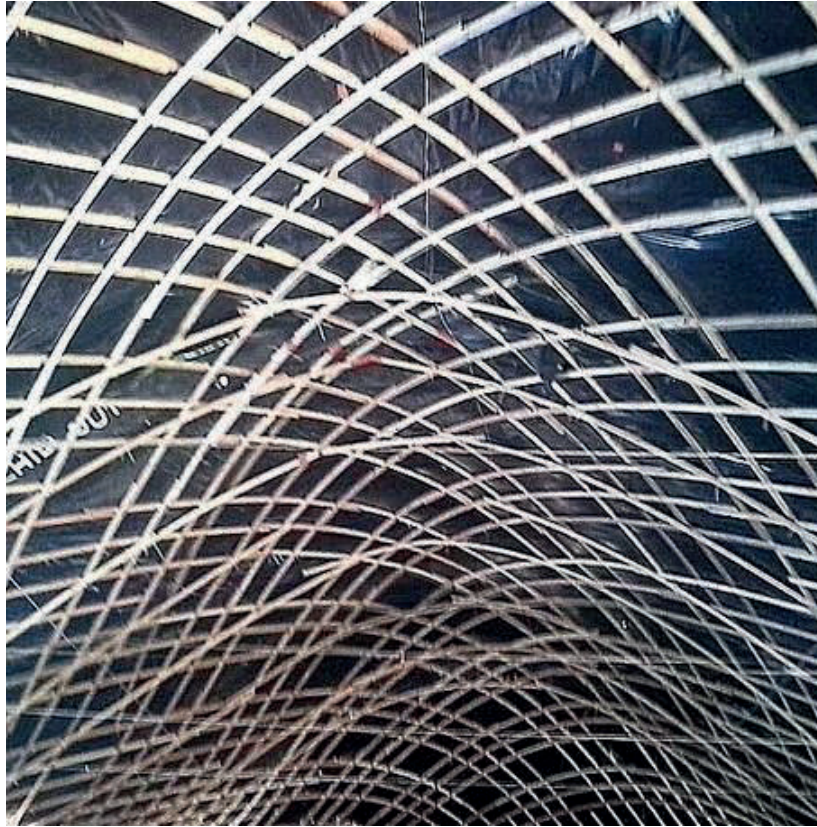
Opaque cladding [by author on 16.7.2015]
